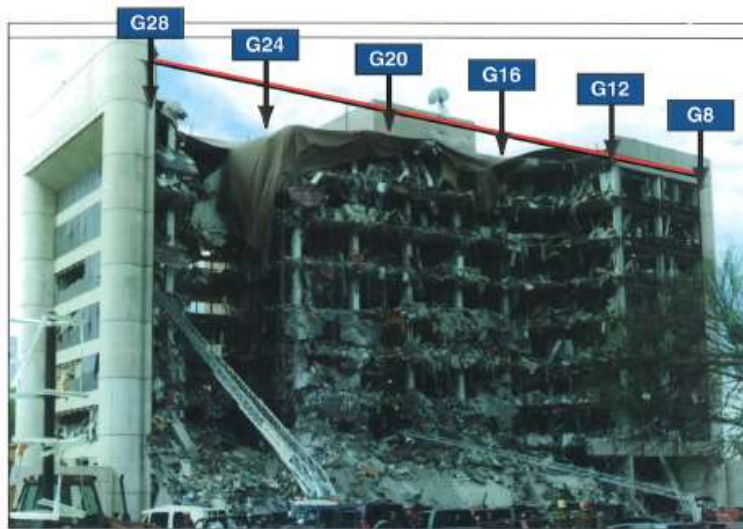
Damage to north and east sides of Murrah Building (FEMA, 1996)
